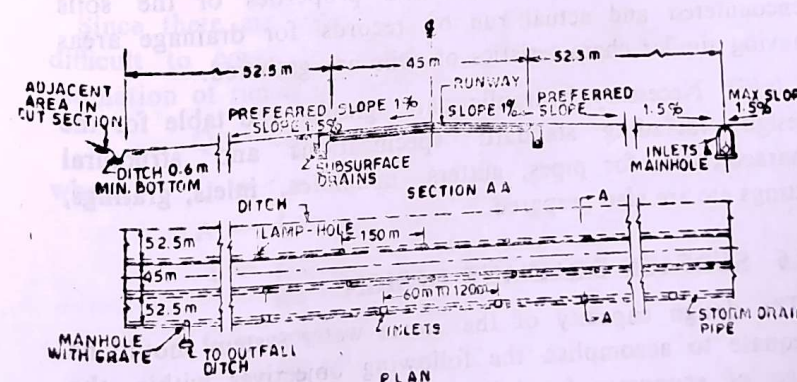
Recommended Drainage Layouts for a Runway (FAA)
